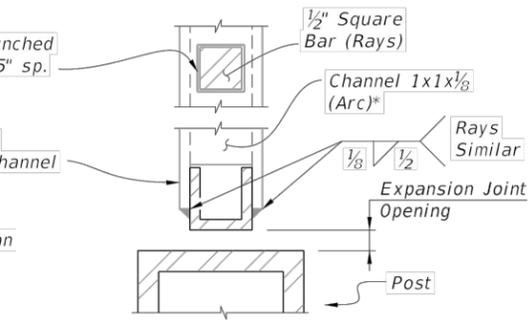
A" INTERMEDIATE RAIL/RAY CONNECTION
